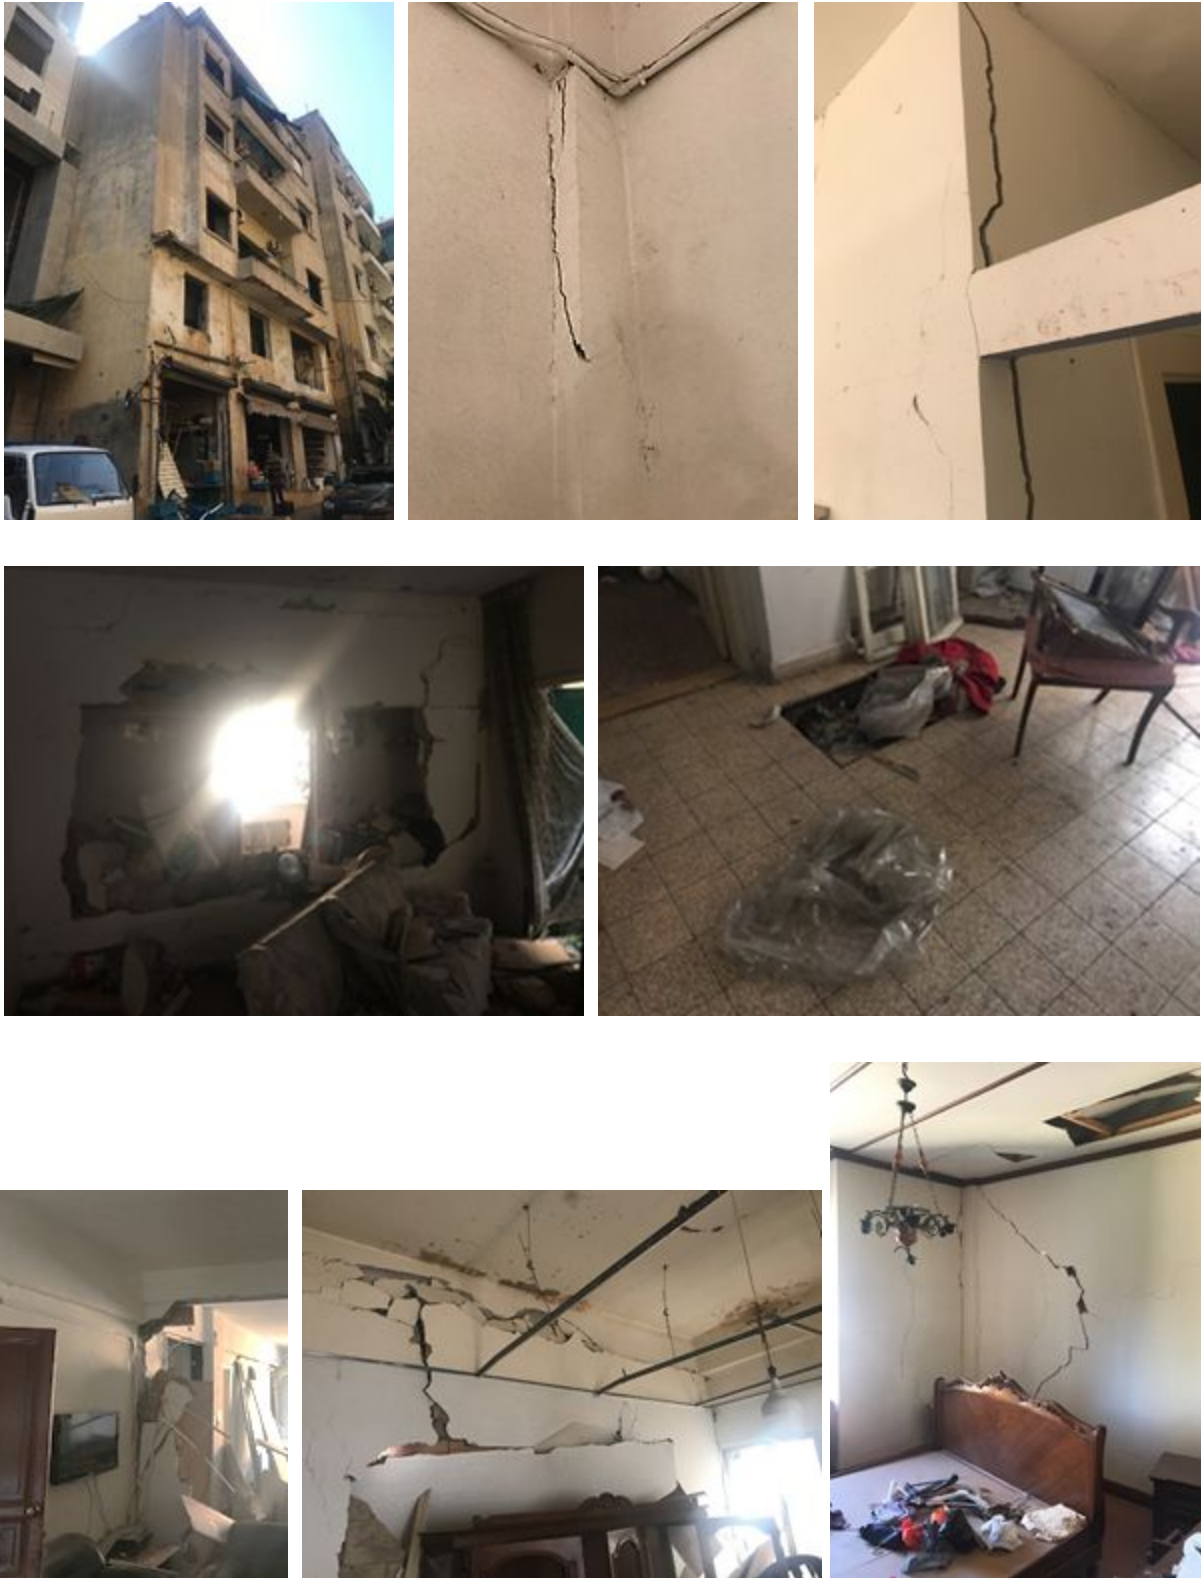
Heavily damaged (D3) older reinforced concrete building RC1 (33.8958° N, 35.5199° E).
